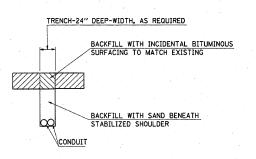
# DETAIL I HANDHOLE TO INTERCEPT EXISTING CONDUIT
